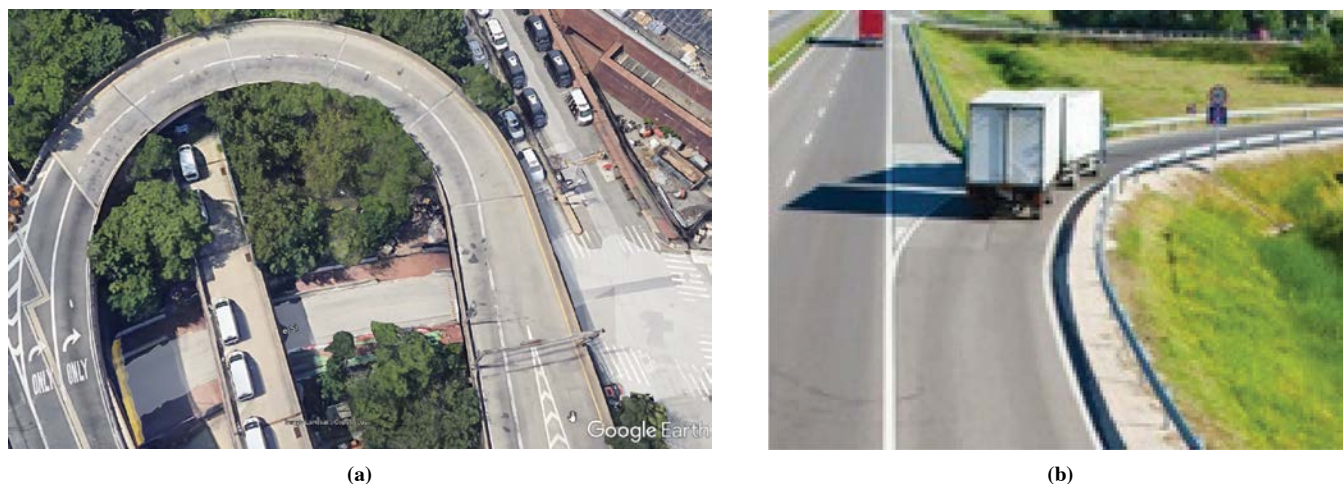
Examples of (a) concrete and (b) steel beam longitudinal barriers on ramps.
